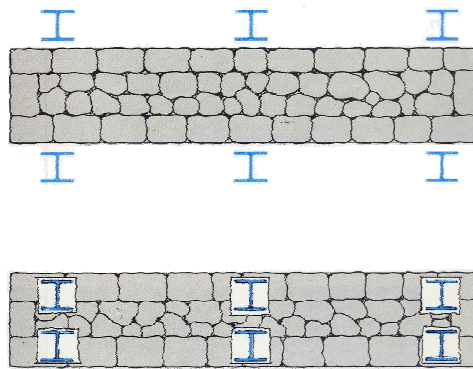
Consolidation of a masonry wall (Mazzolani) [159]
